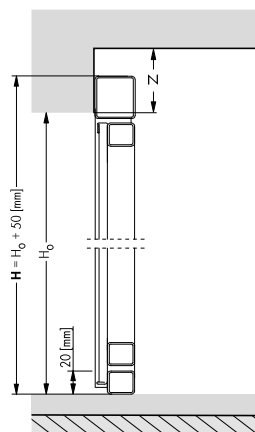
Installation behind the opening - vertical section (Novum, Progress, City).
